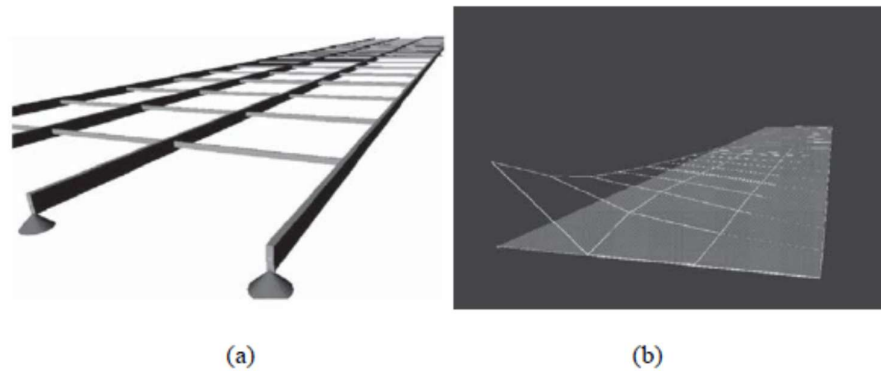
A grillage bridge model taken from NCHRP report 592 a) non-deformed shape before truckload application b) deformed shape after truck load application
